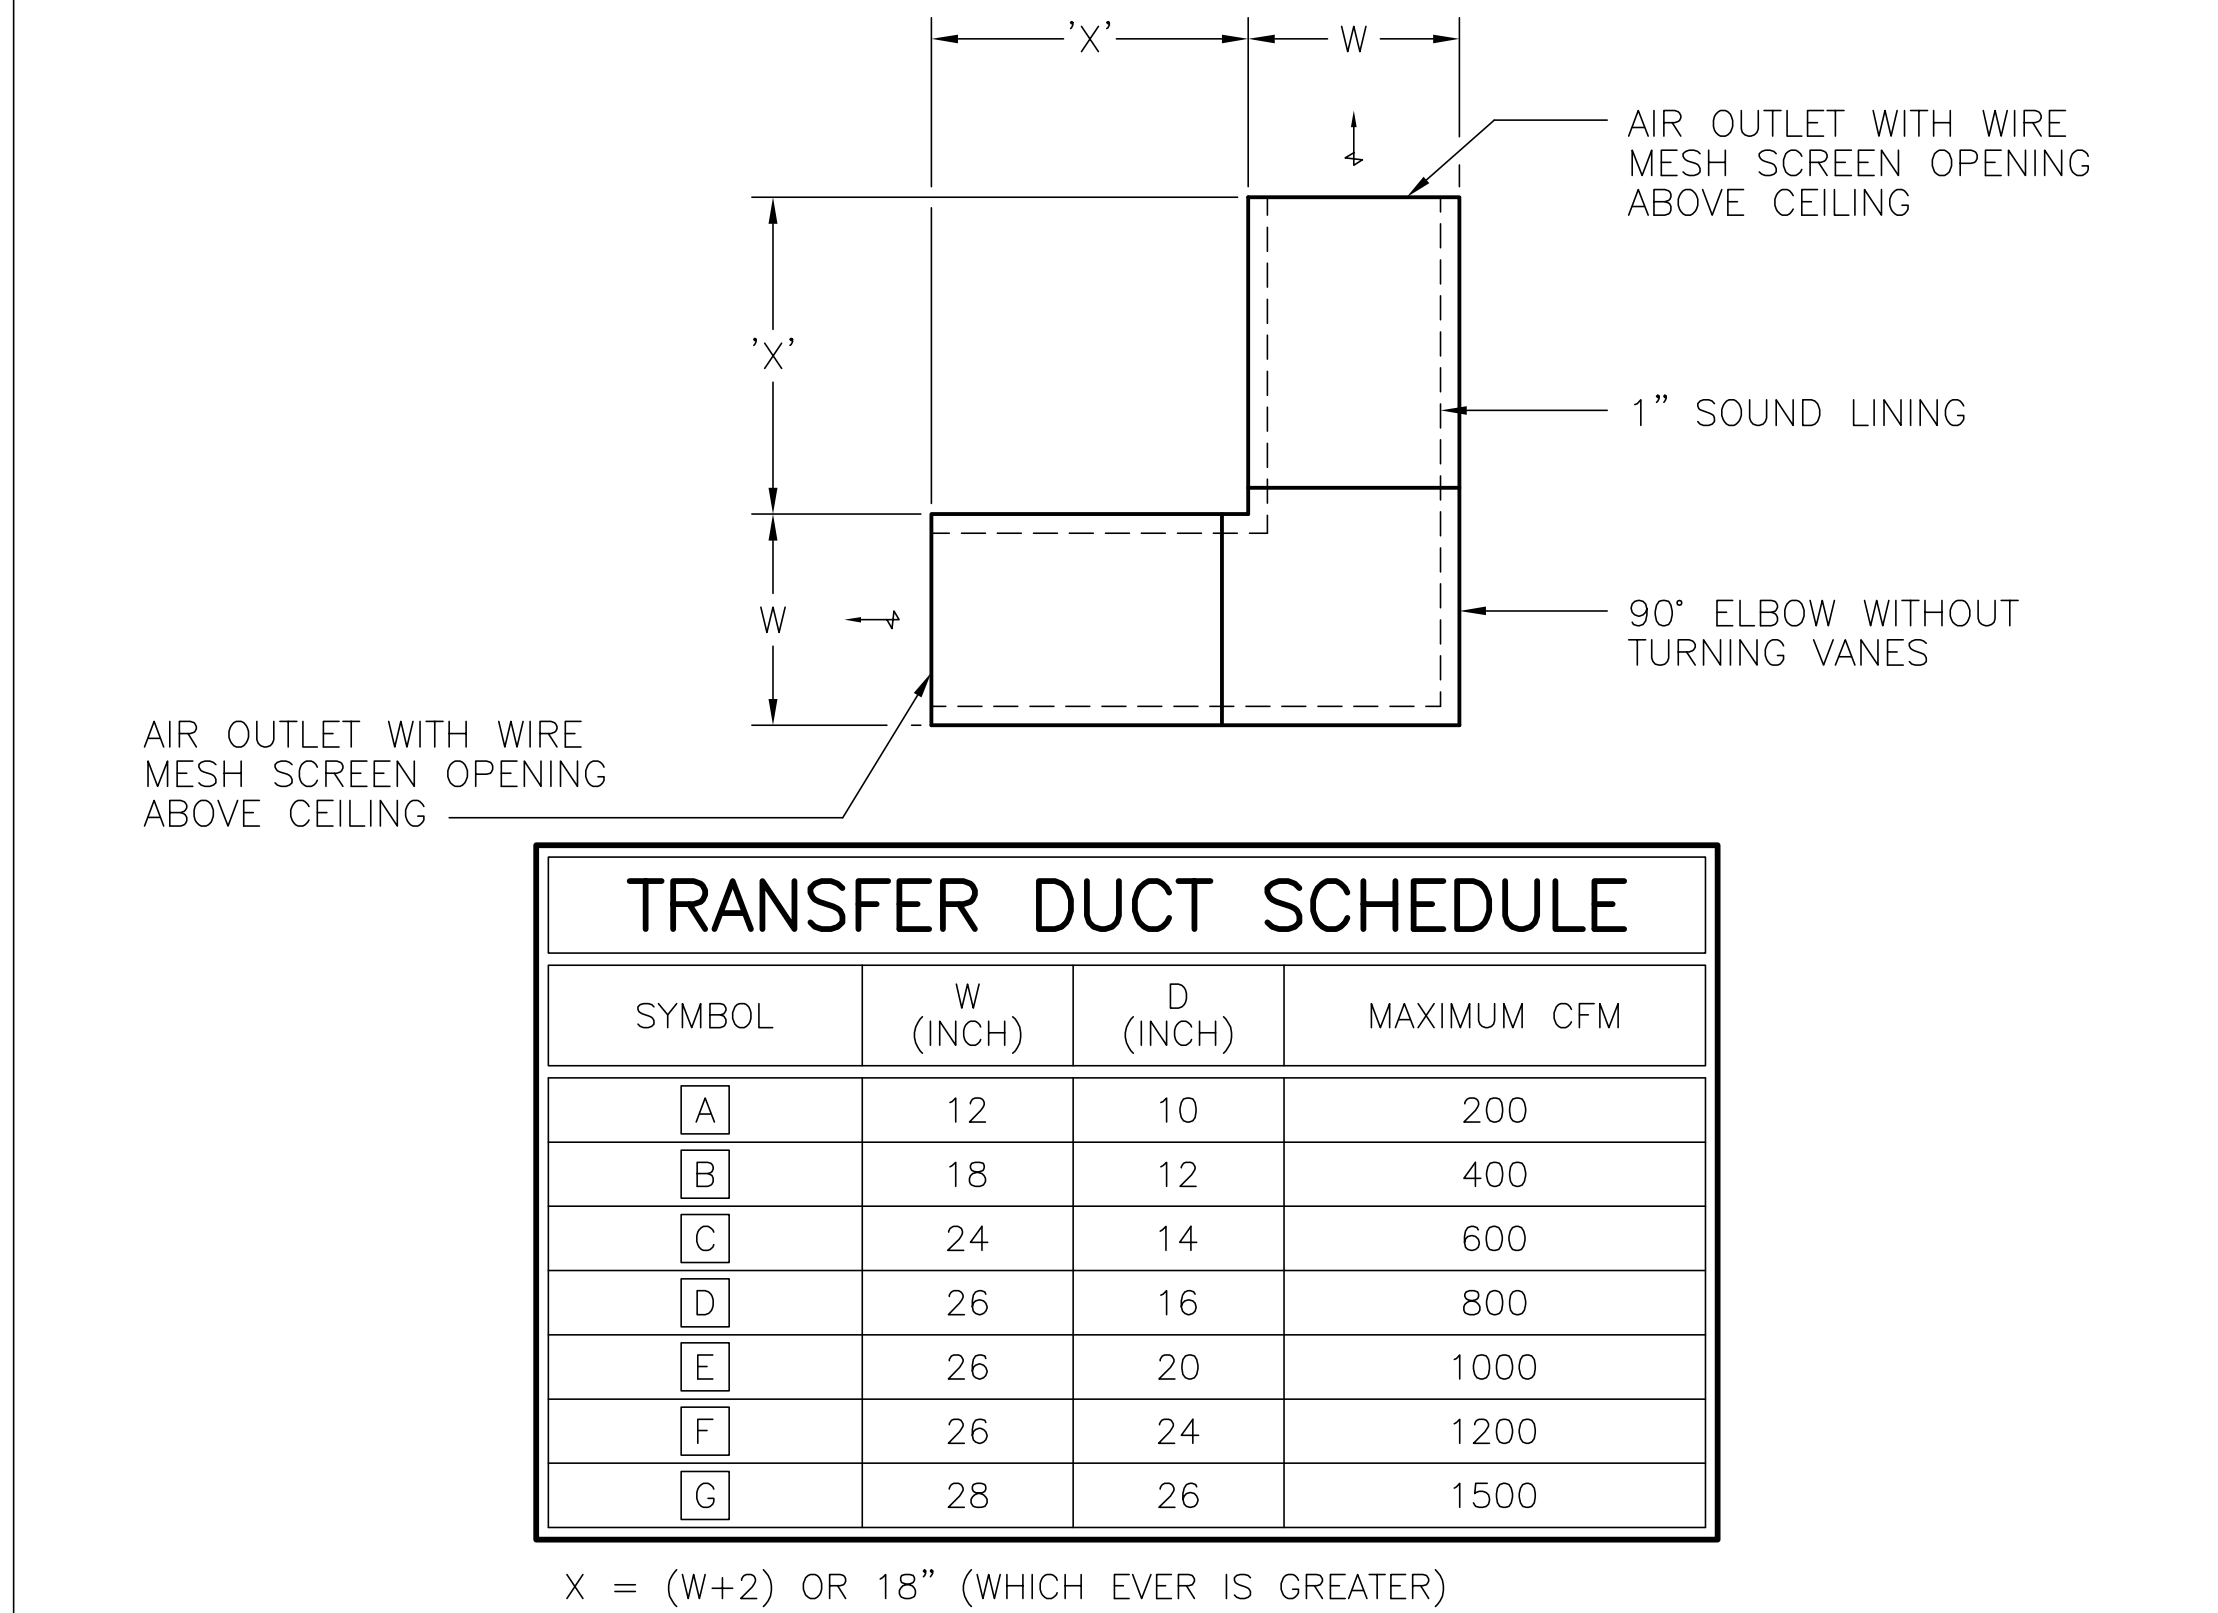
DETAIL - RECTANGULAR DUCT FITTINGS SCALE: NONE 4
